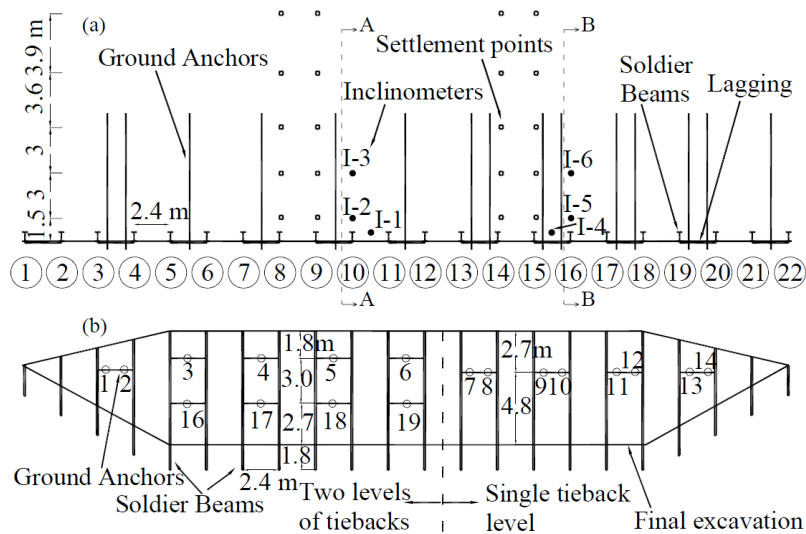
Schematic of the Texas A&M University full scale model excavation site (Weatherby *et al.* 1998); (a) plan view and instruments layout and (b) elevation view of the wall
